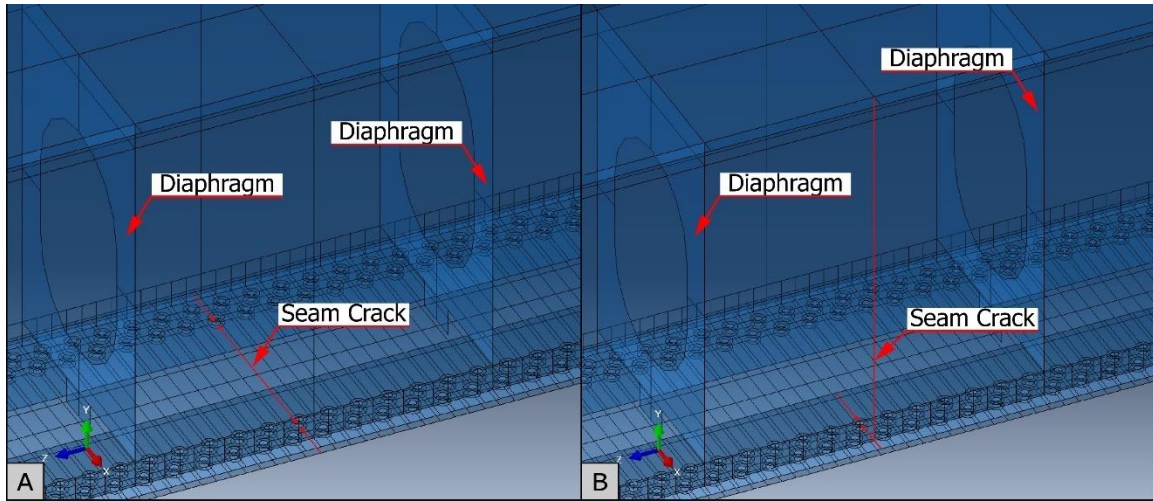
Specimen B2 FE model: seam cracks defined on (A) bottom flange plate, and (B) flange connection plate and web plate
